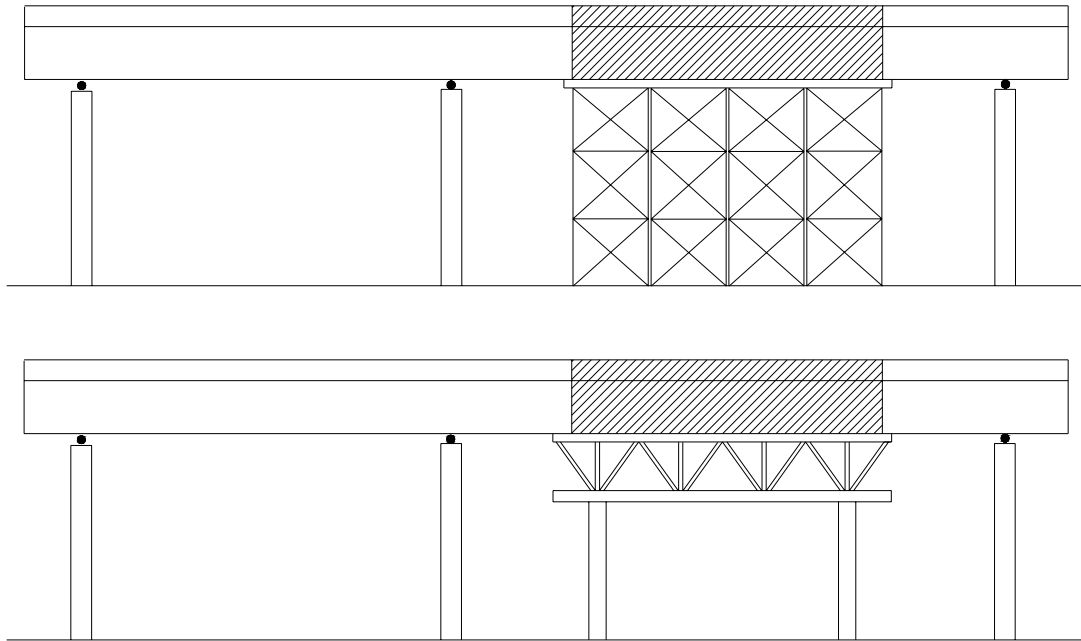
Top: Bridge constructed with scaffolding. Bottom: Bridge constructed with falsework.
